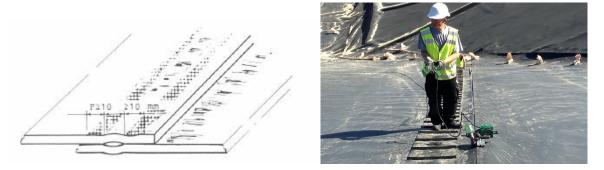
Double welding of a HDPE liner. The welding can be tested by applying pressurized air to the air channel between the welding seams.
